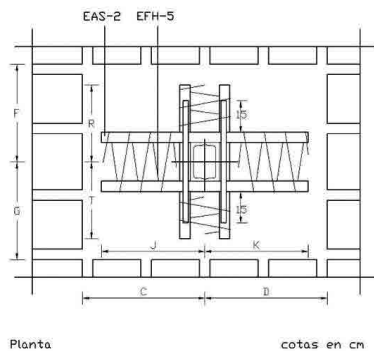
Internal steel pier anchorage. In NTE (Normas Tecnológicas de la Edificación).
